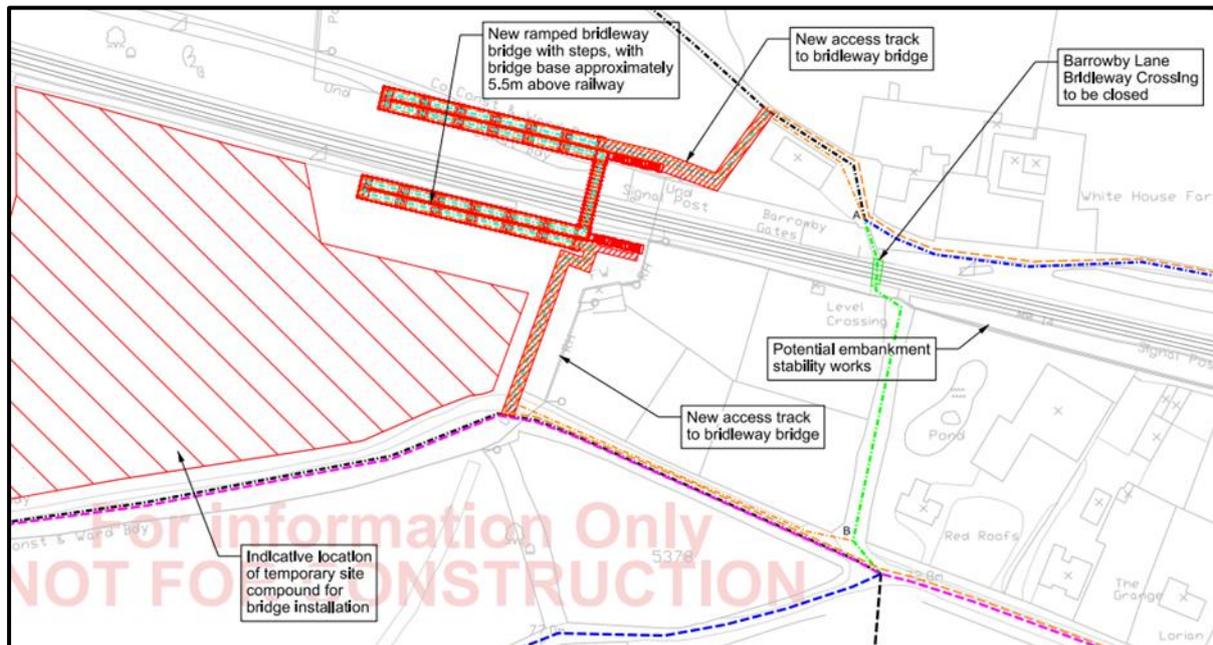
Proposed ramped and stepped brideway bridge structure, construction compound and existing level crossing locations
